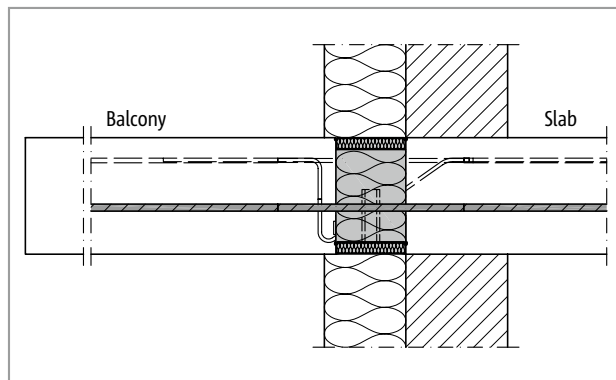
Schöck Isokorb® XT type K, H-NN: Masonry with external insulation
